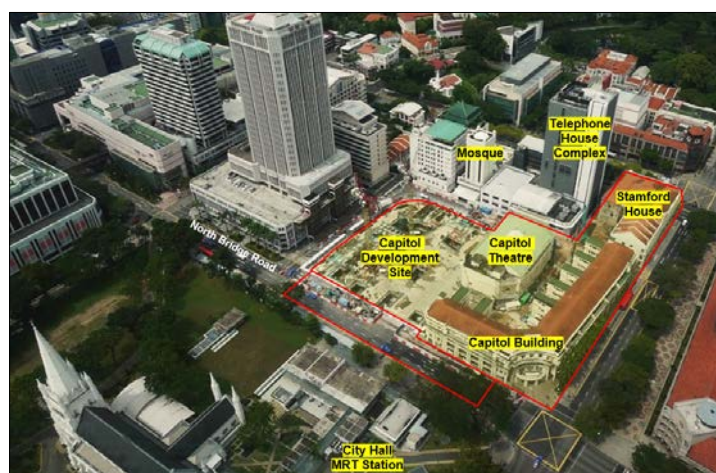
Site Layout and its Neighboring Structures (Capitol)
